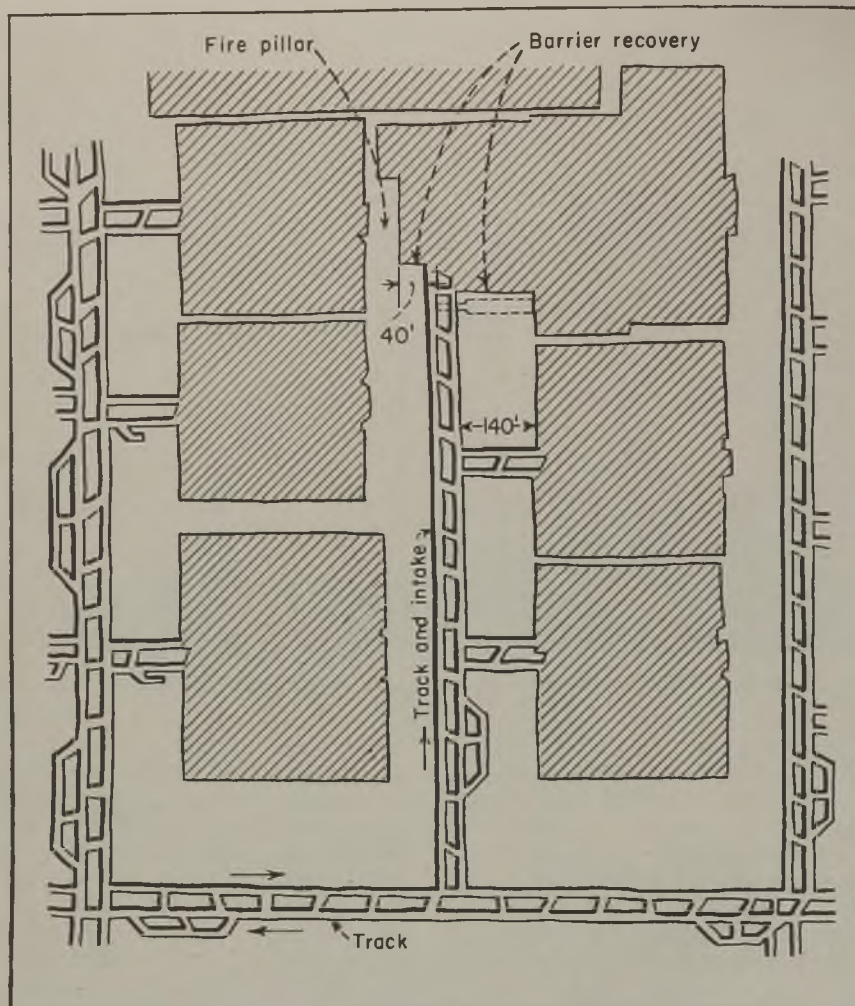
Showing barrier recovery in one section of Imperial mine. That on the right is being completely removed. That on the left is being partly removed, leaving a fire pillar
